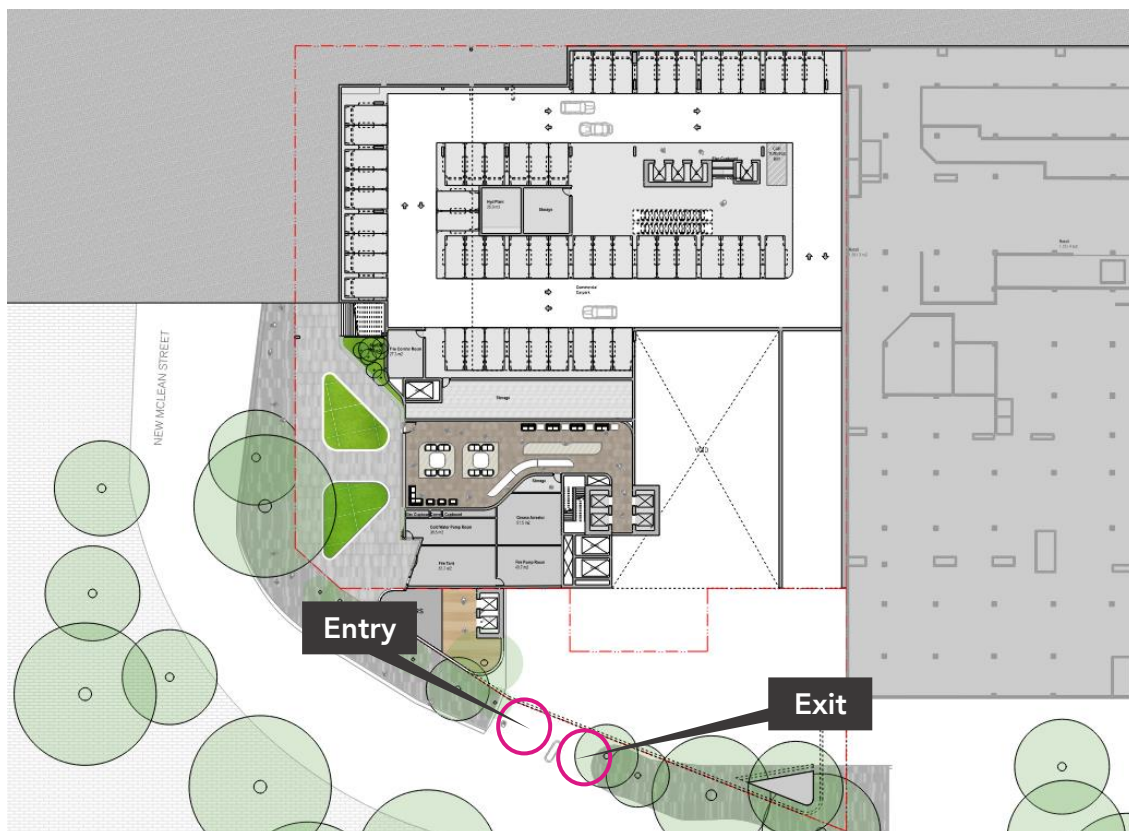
Proposed Vehicular Access Arrangement (Source: FJC Studio)
